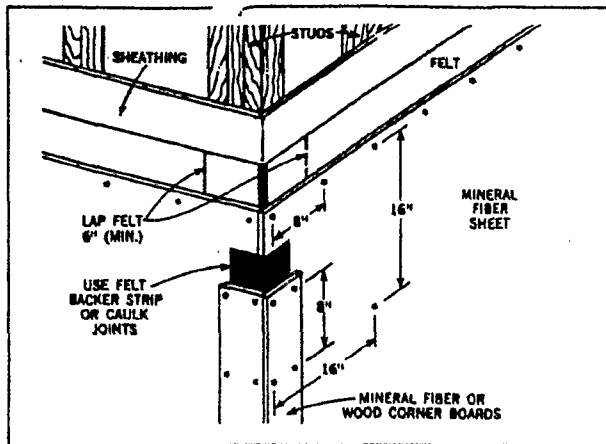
EXTERIOR CORNER BOARDS - Either caulk at sheet joints or use a felt backer strip over sheet joints behind corner boards.
